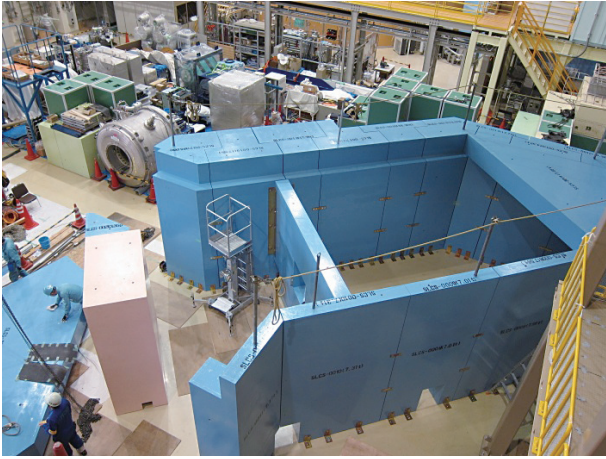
Installation of the S-Line concrete shields. The photo was taken without the ceiling shields.
